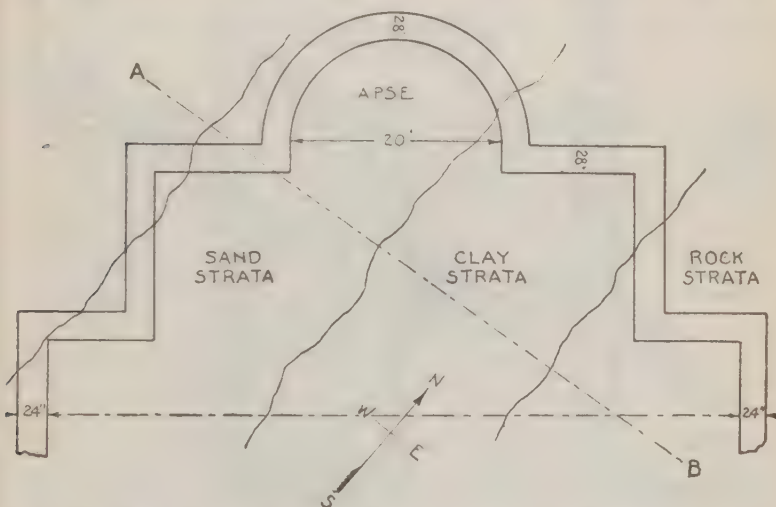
,768.—Foundation plan of part of a church showing various materials, sometimes found in excavating.
